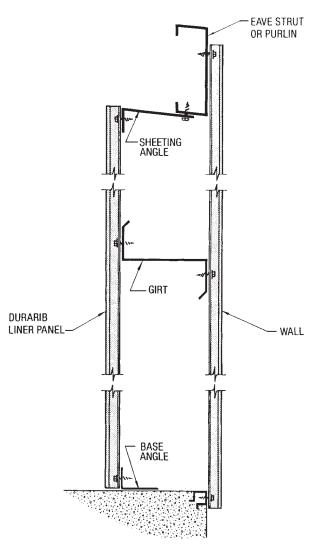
Wall siding and liner panels provide finished appearance—and lateral bracing for girts. (*Star Building Systems*.)
